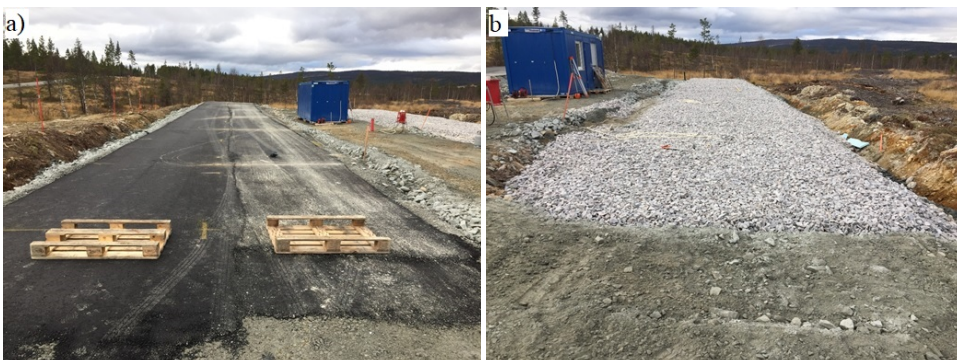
Completed field test site: a) road stretch; b) railway stretch
